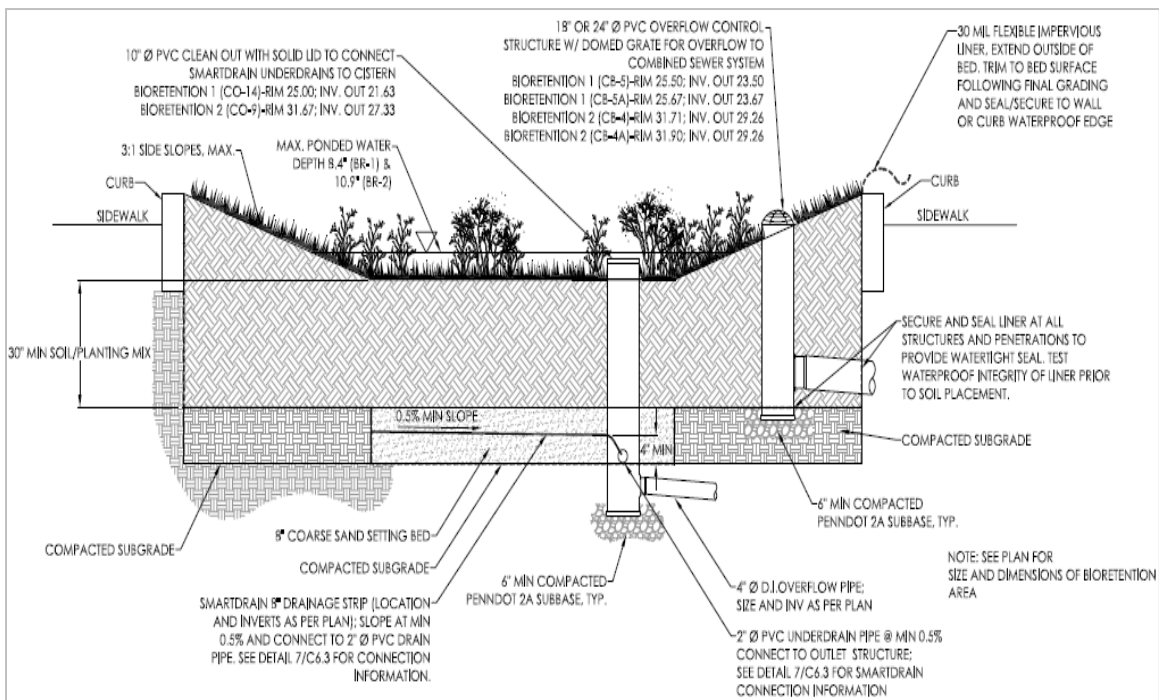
Detail of a Typical Section View of Biofilter Facility (Source: Meliora Environmental Design, LLC, Photo Used with Permission).
